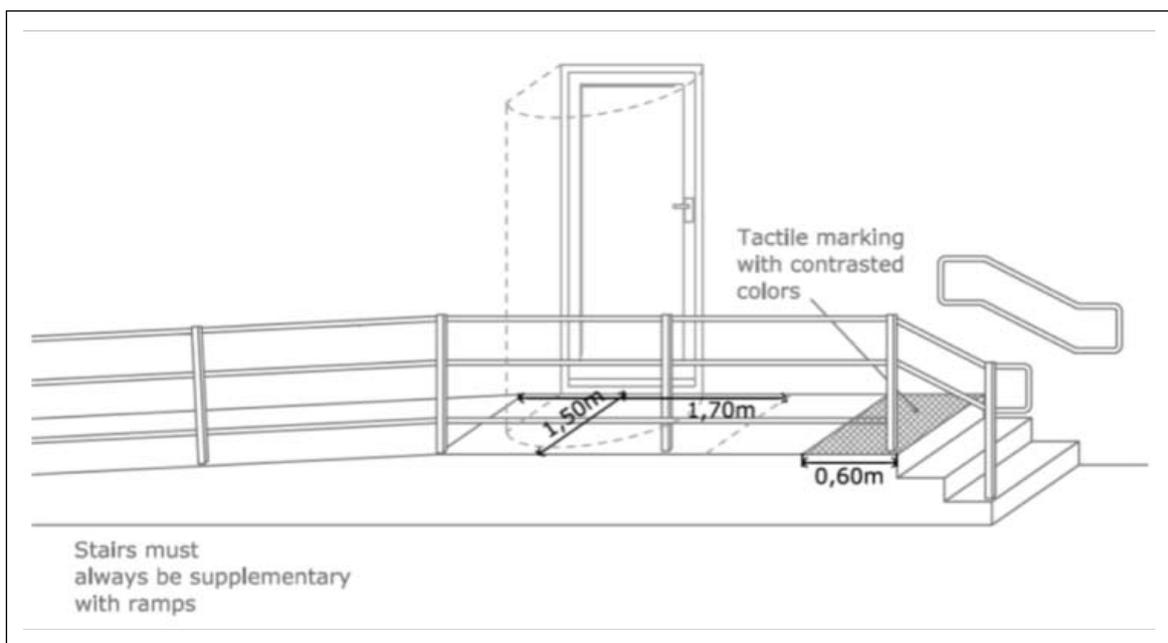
Ramp and stair case with support rails (UNAPD, 2010)
